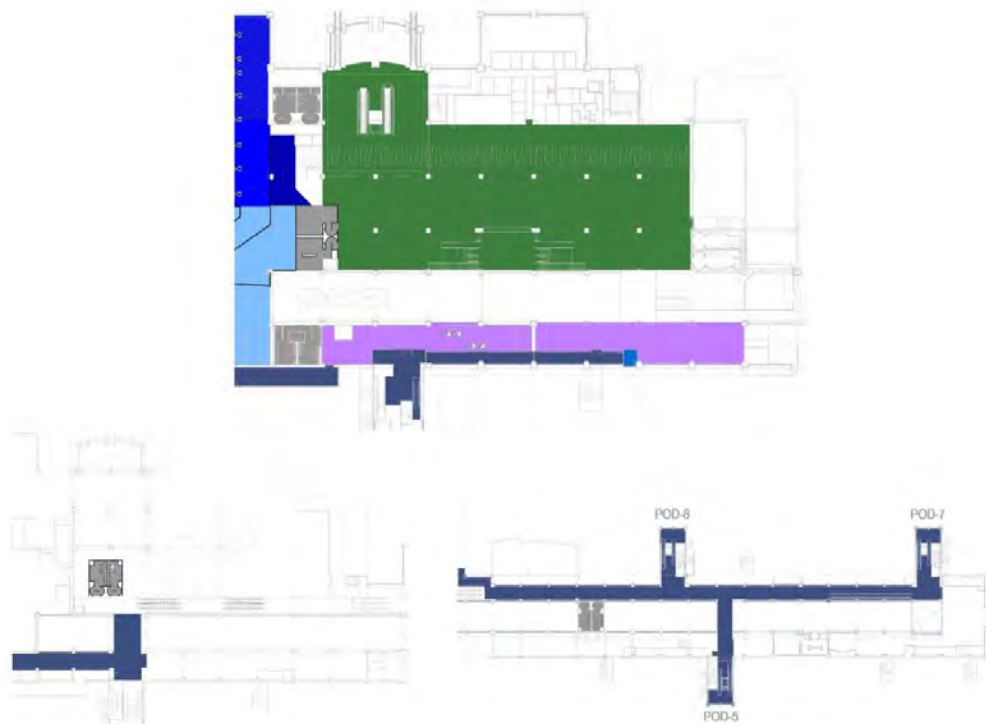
Alternative 3 – Future Proofing (2 of 2)
